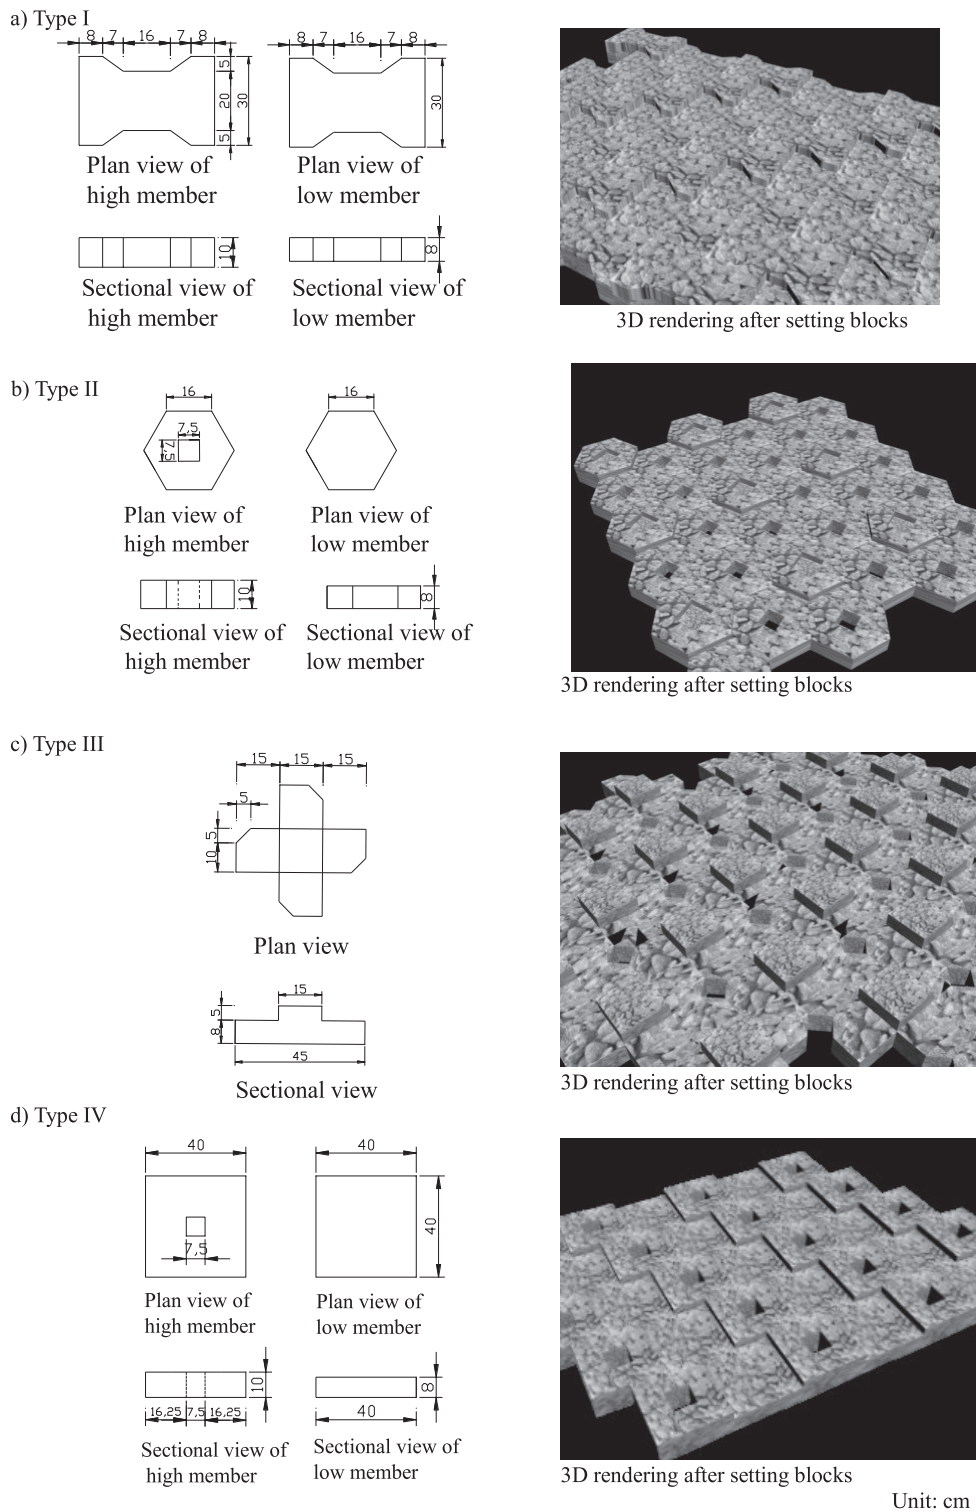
Structural design diagram of prefabricated grass-planting concrete blocks.
